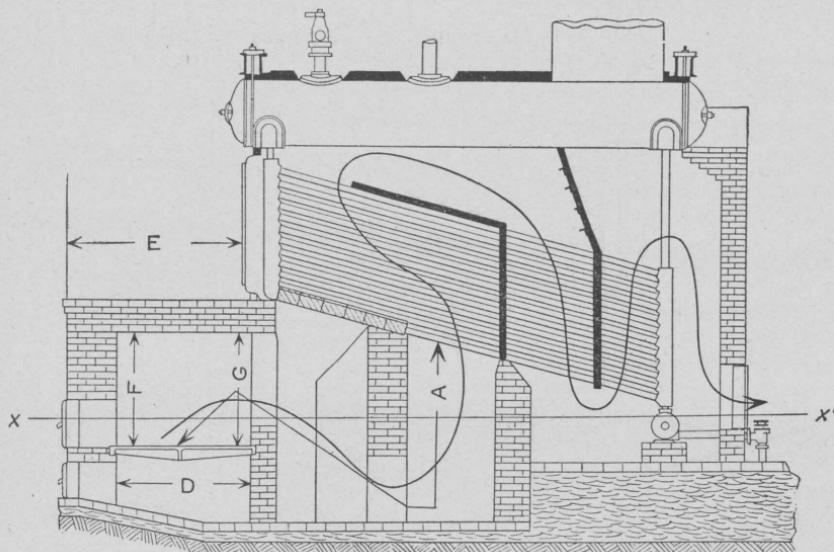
A hand-fired furnace and Babcock & Wilcox boiler, elevation.  $X-X'$ , Line of sectional plan, figure 30.
